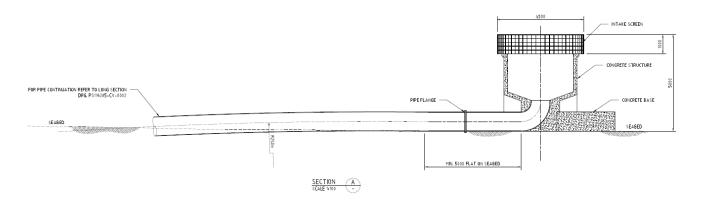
General arrangement of the proposed intake structure above the seabed (WSP 2019).
